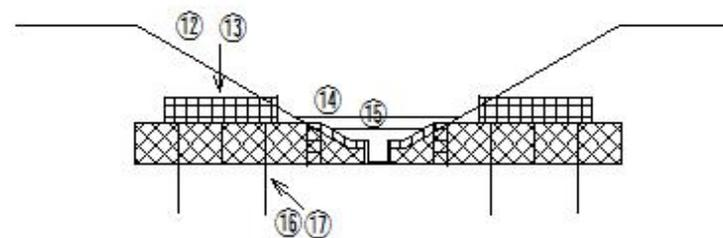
(2) Example of installation of sand retaining wall using Gabion basket, etc.
